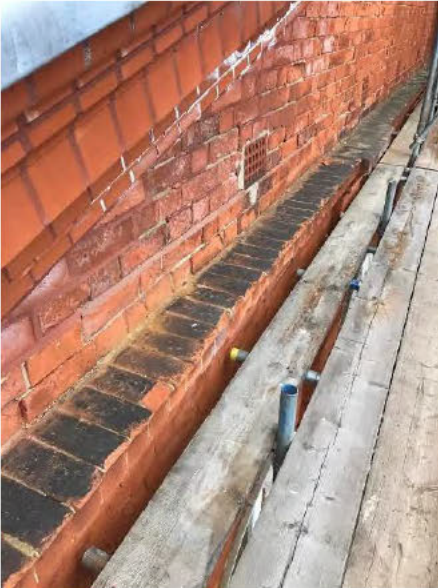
Efflorescence staining and minor spalled brickwork to high level external wall.
